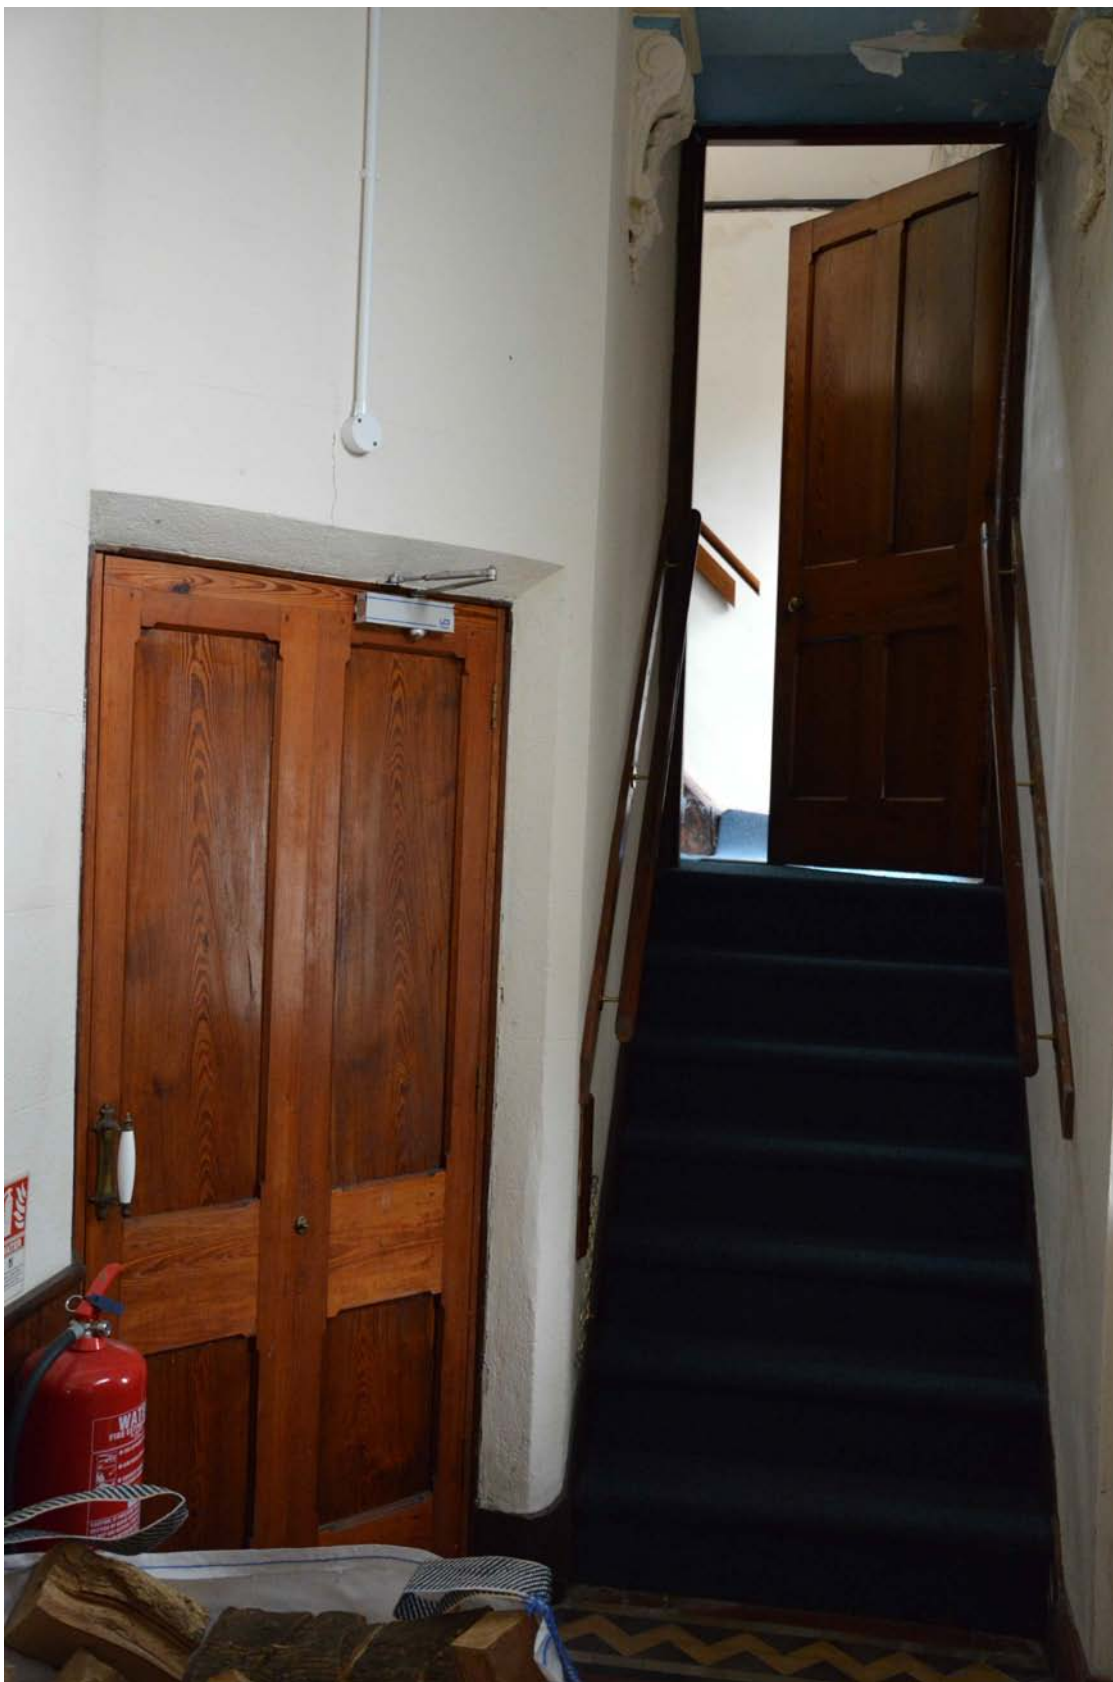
Stairs to 1<sup>st</sup> floor and balcony. Looking south
